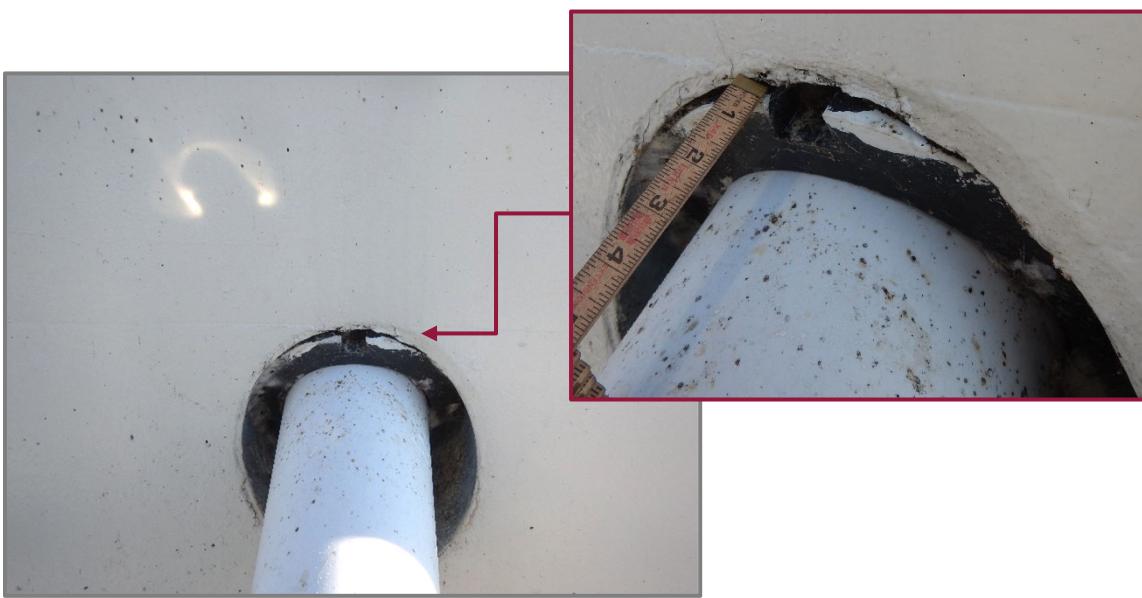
Rubber gasket slightly extruded from steel guide tube (looking north at Cable B13E on the south face of Tower 3).
